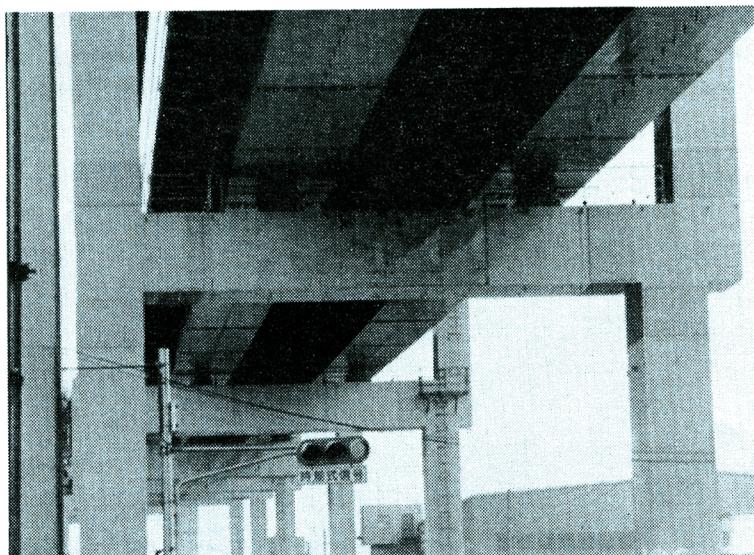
Buckling of web plates at center beam of a highway viaduct bent frame
